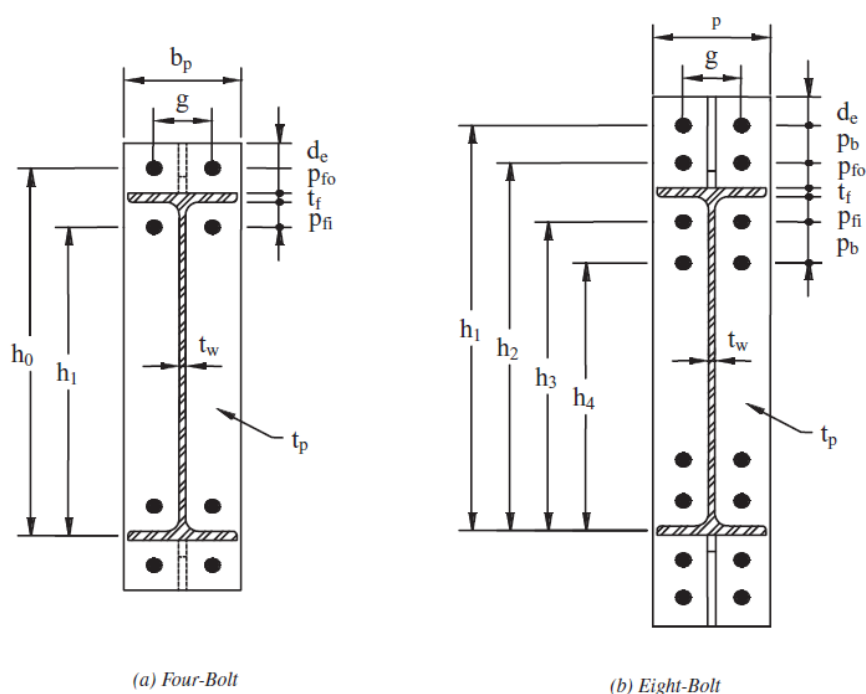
Four bolt and eight bolt dimension and distances used in bolt size design equations [7].
